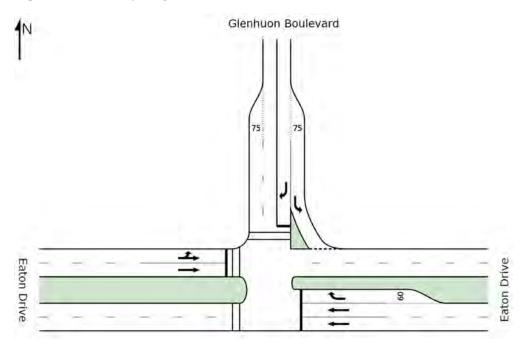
Concept Layout for the Intersection of Eaton Drive / Glenhuon Boulevard
